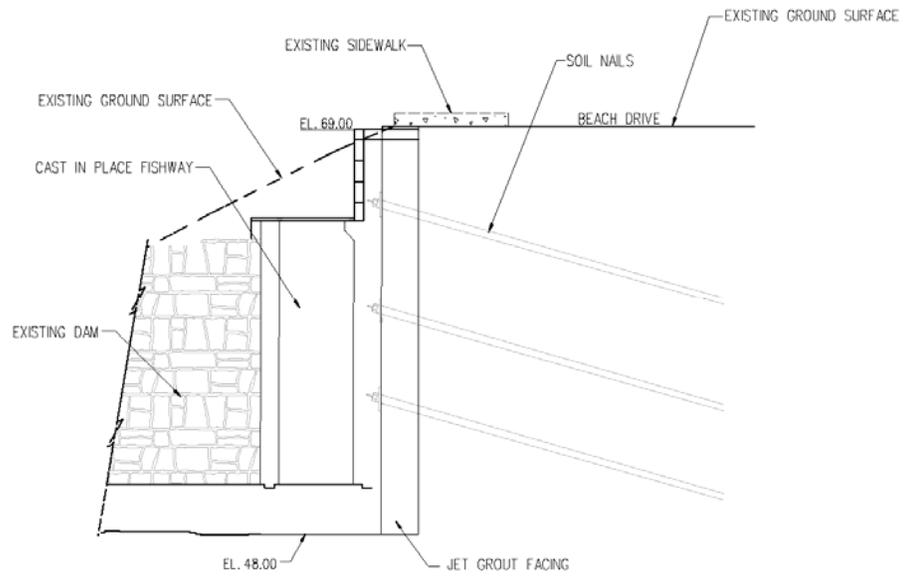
Cross Section B through Soil Nailed Wall at Dam and Beach Drive (KCI 2003)
